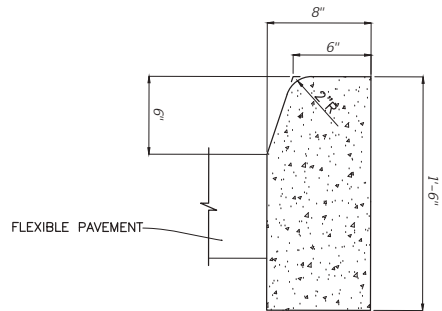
OPTION 1 TRAFFIC SEPARATOR
